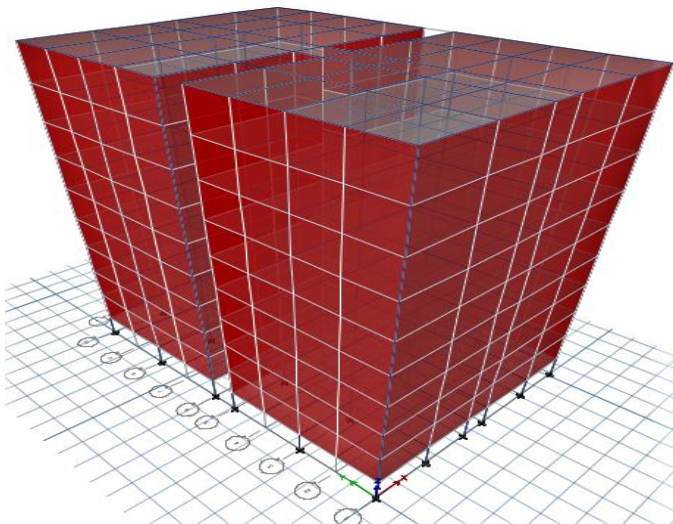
3D view of model1(G+9) multistoried bare frame building without bracing in IS code
